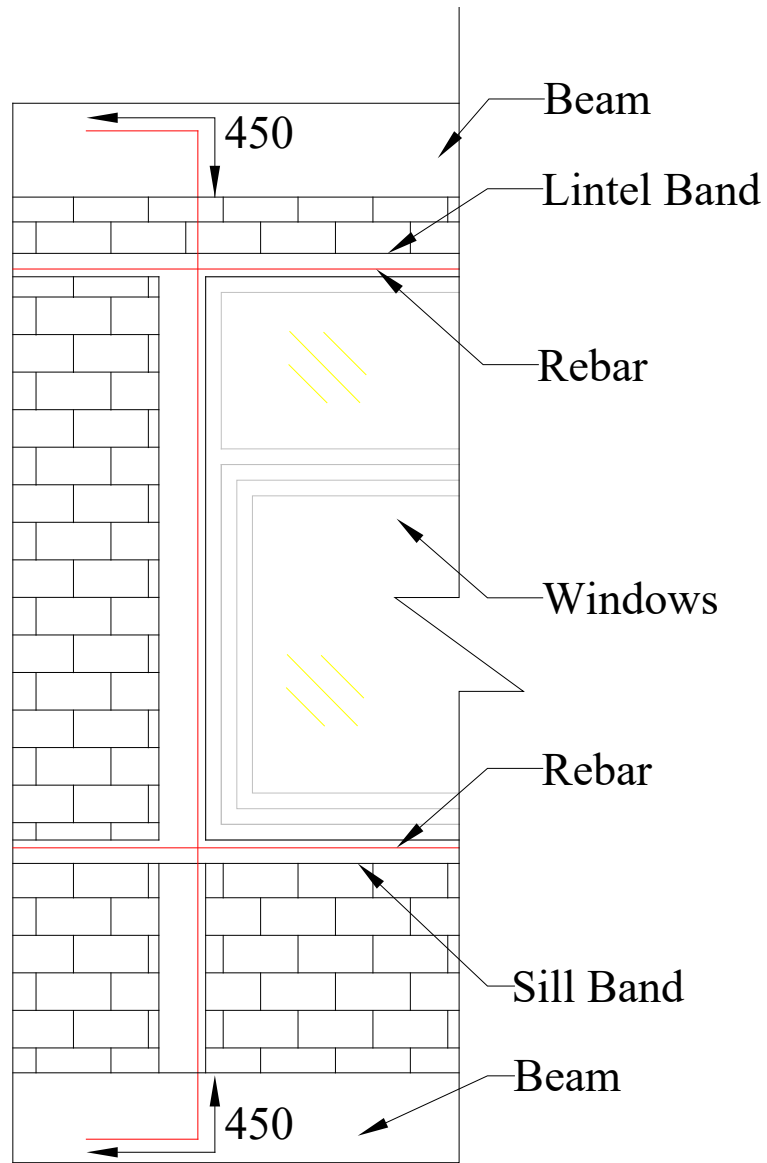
BAND DETAILS FOR SOLID WALL WITH OPENING
